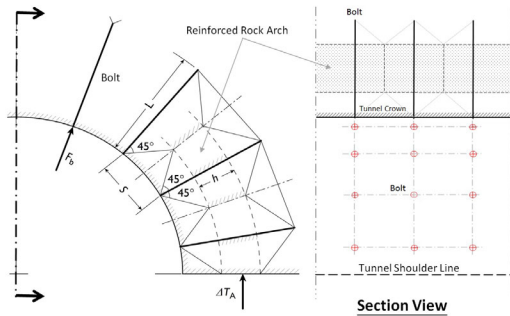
Geometry of tunnel bolting and rock arch thickness.
